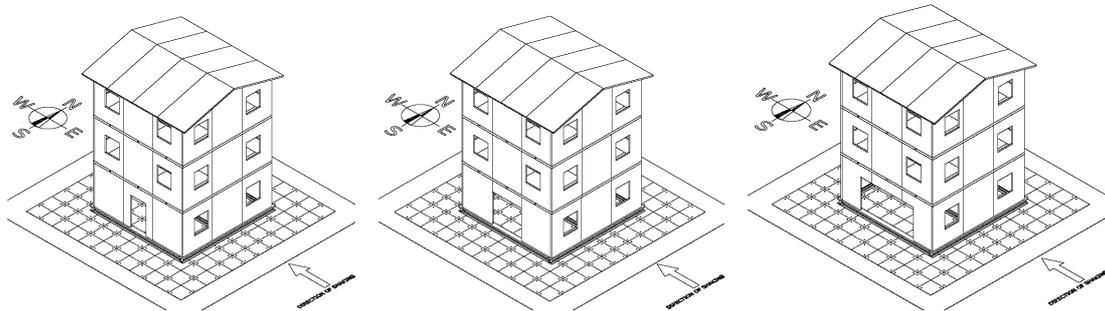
Three different configurations in which the building have been tested. While Configuration A and B are symmetric (the door opening widths in the two external walls parallel to the shaking direction were respectively 1.2 and 2.4m), Configuration C is asymmetric as the width of the openings in the two external walls parallel to the shaking direction were 2.4 and 4.0m.
